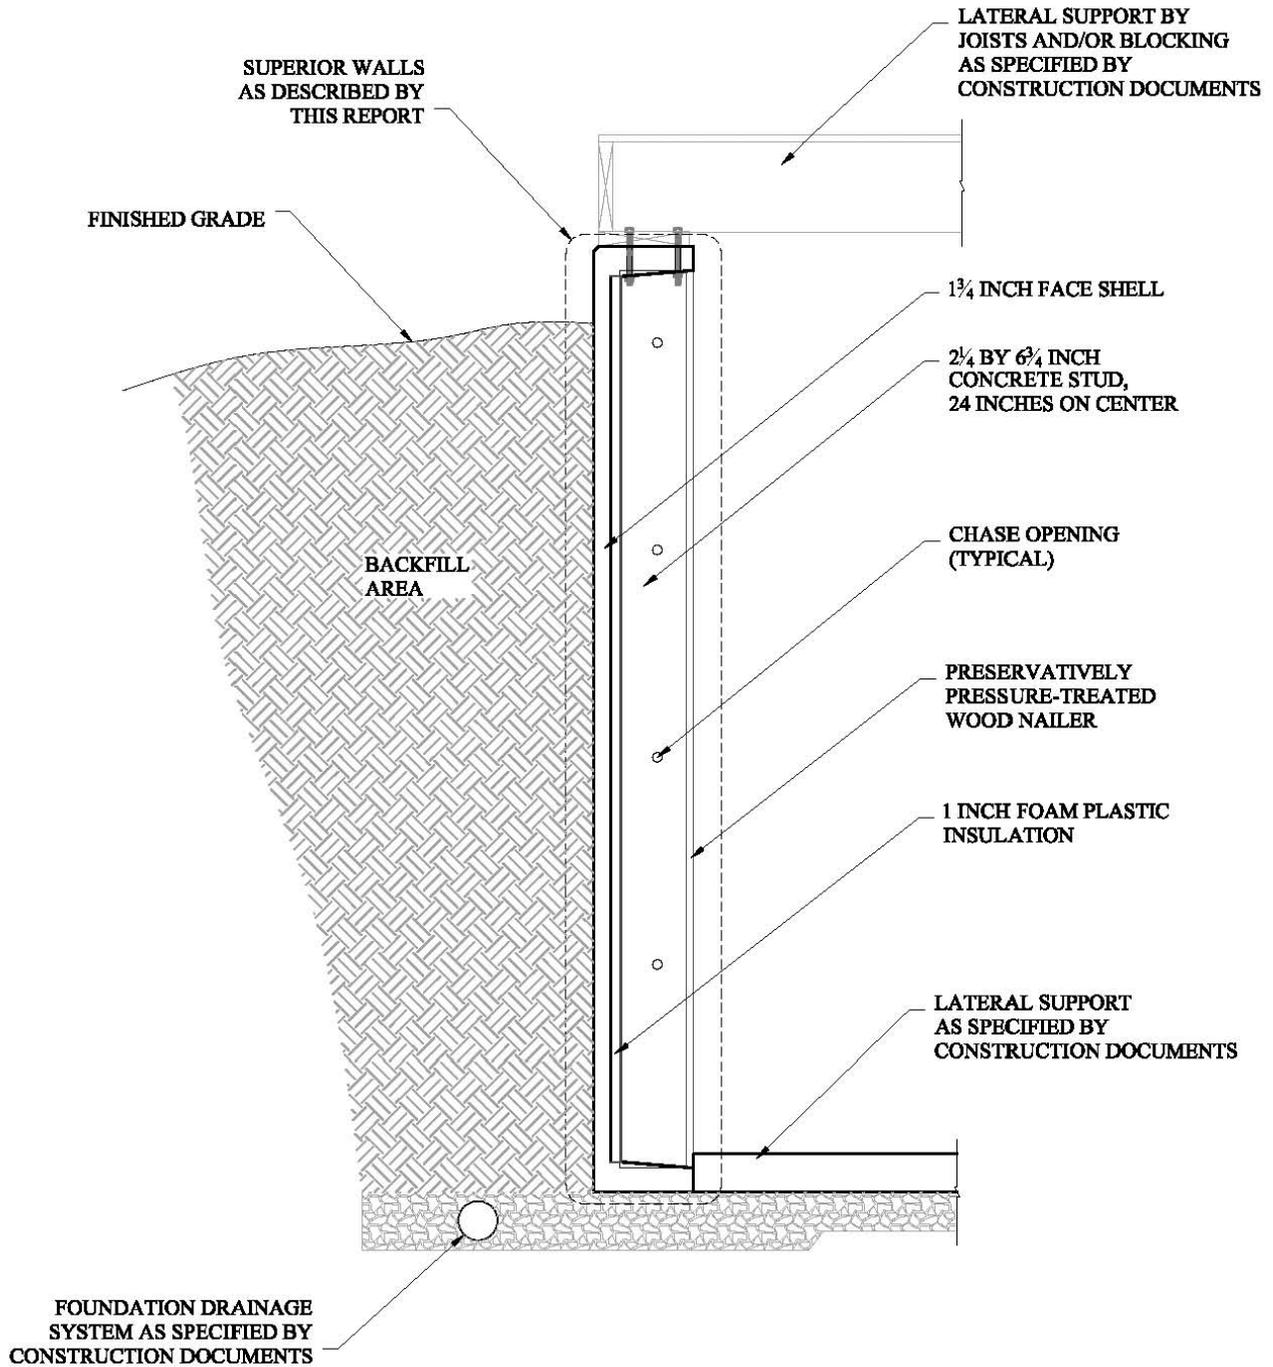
TYPICAL SUPERIOR WALL VERTICAL SECTION DETAIL
